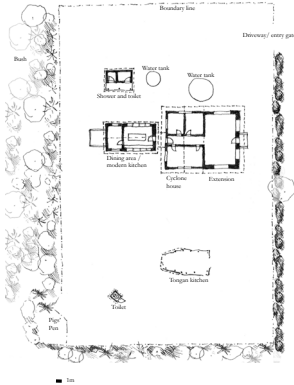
Site and floor plan sketch of Siieli's property, author May 2014
